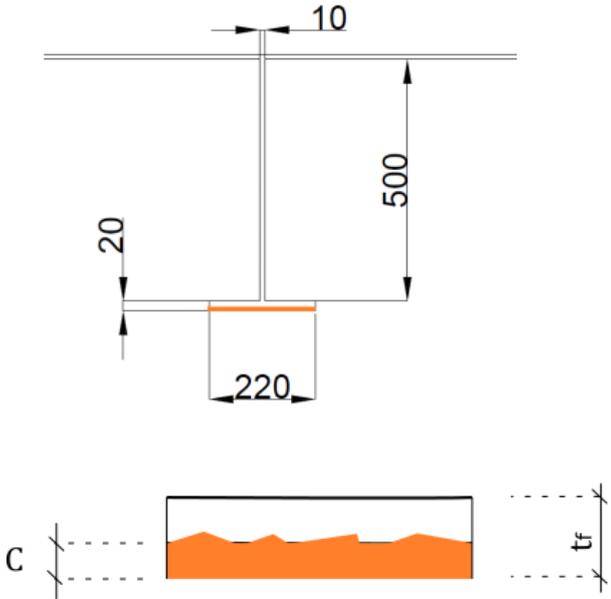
Uniform corrosion of bottom flange secondary crossbeam.
